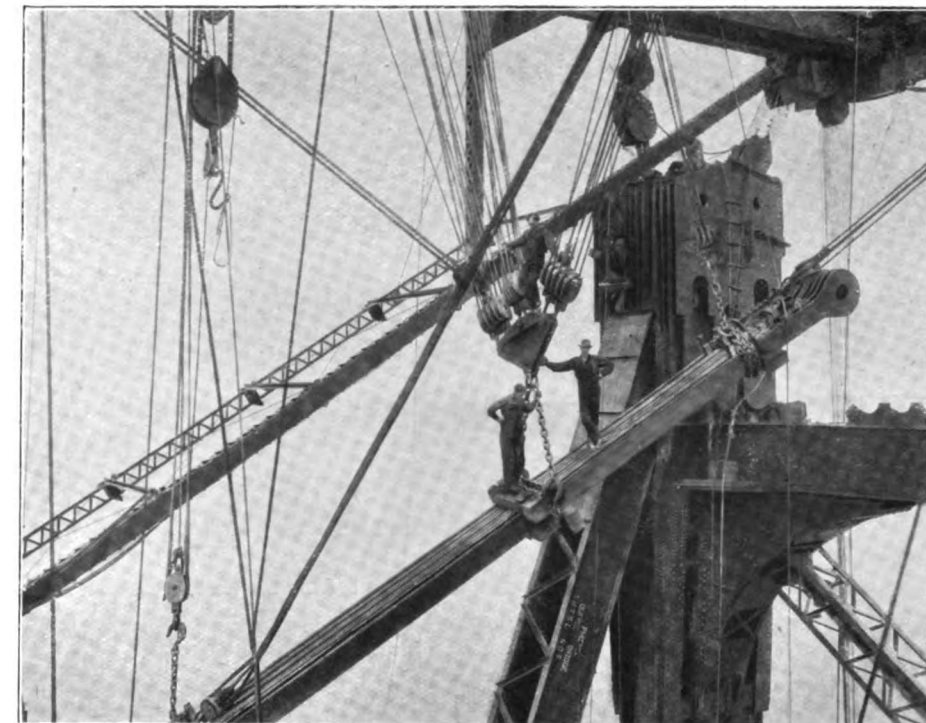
HOISTING CENTRE PANEL TOP CHORD EYE-BARS INTO POSITION.
